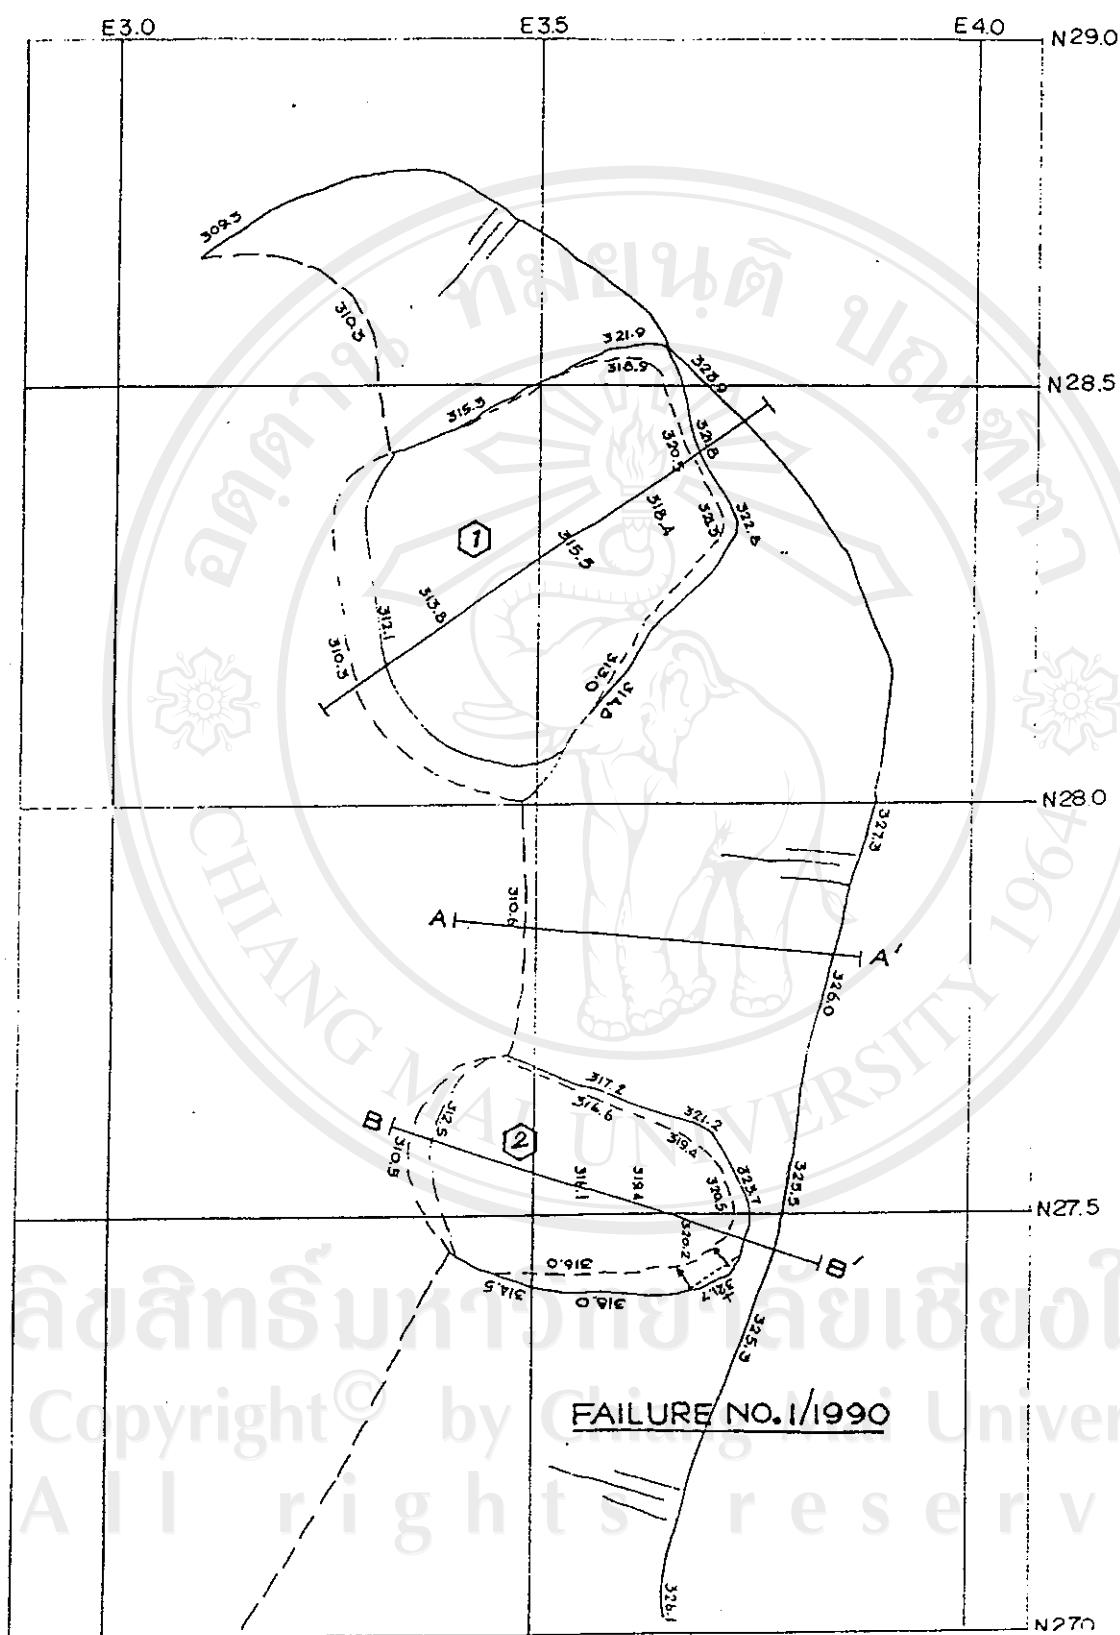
Profile plan of the failure slope in Mae Moh Dam, Lampang
